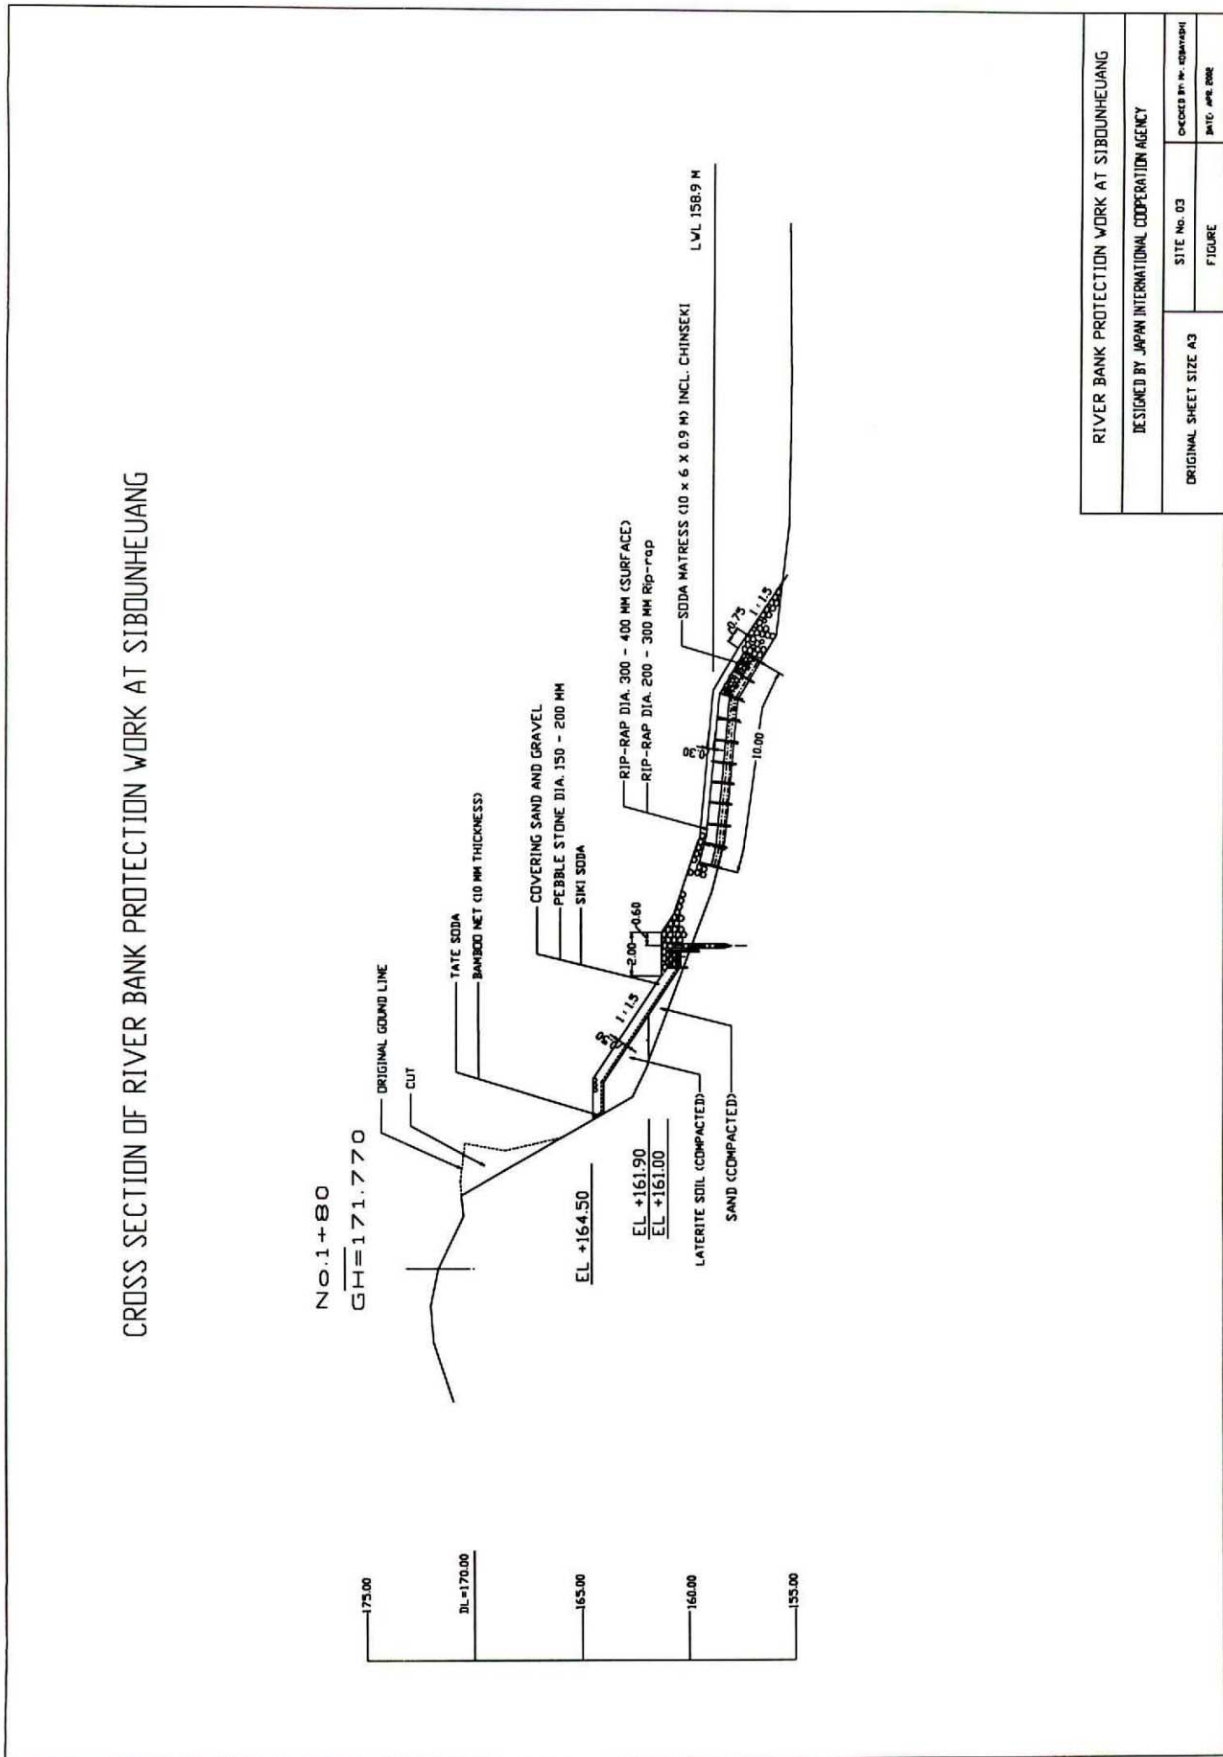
(4/5) Cross Section of River Bank Protection Work at Sibounheuang Site
